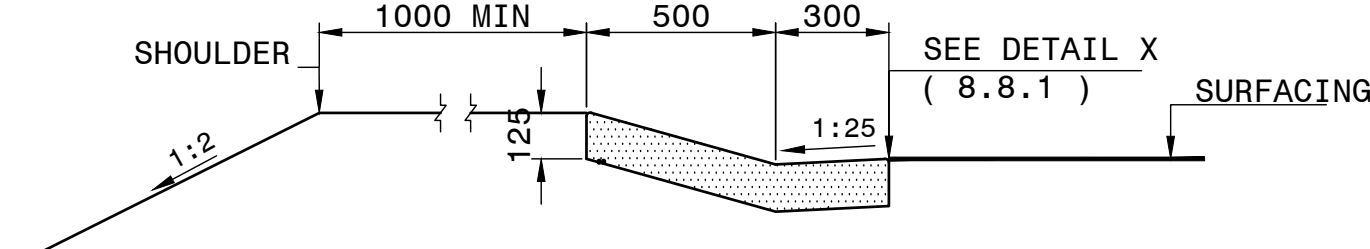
DETAIL OF TYPE 'C' IN SITU MOUNTABLE KERB AT INTERSECTIONS
